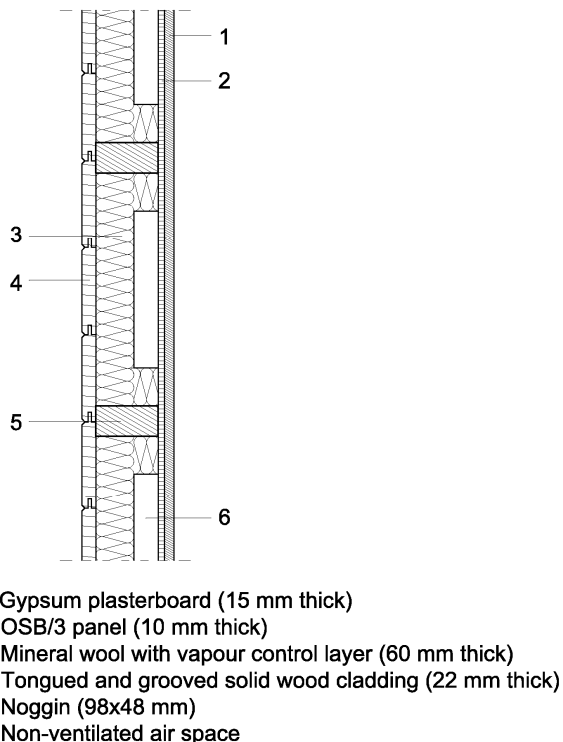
Vertical cross section of external walls with external timber cladding and internal gypsum plasterboard.
